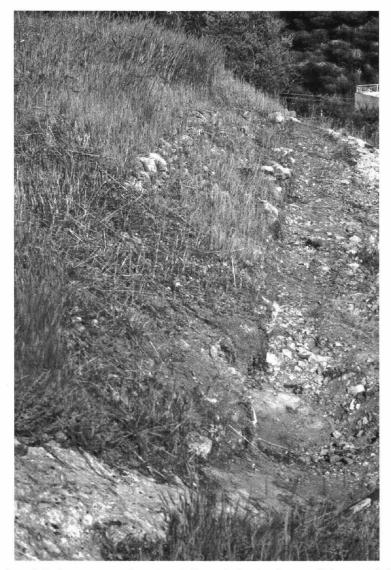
Area A-3: A. remnants of revetment. B. eroded embankment, C. later retaining stones
